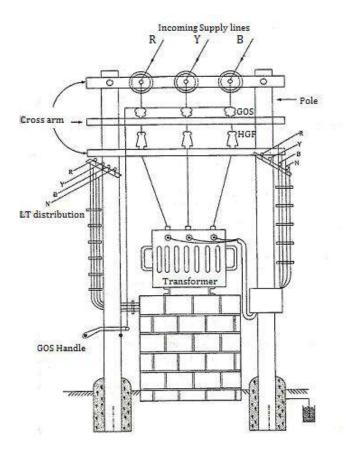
Layout and schematic connections of Pole mounted substation.
